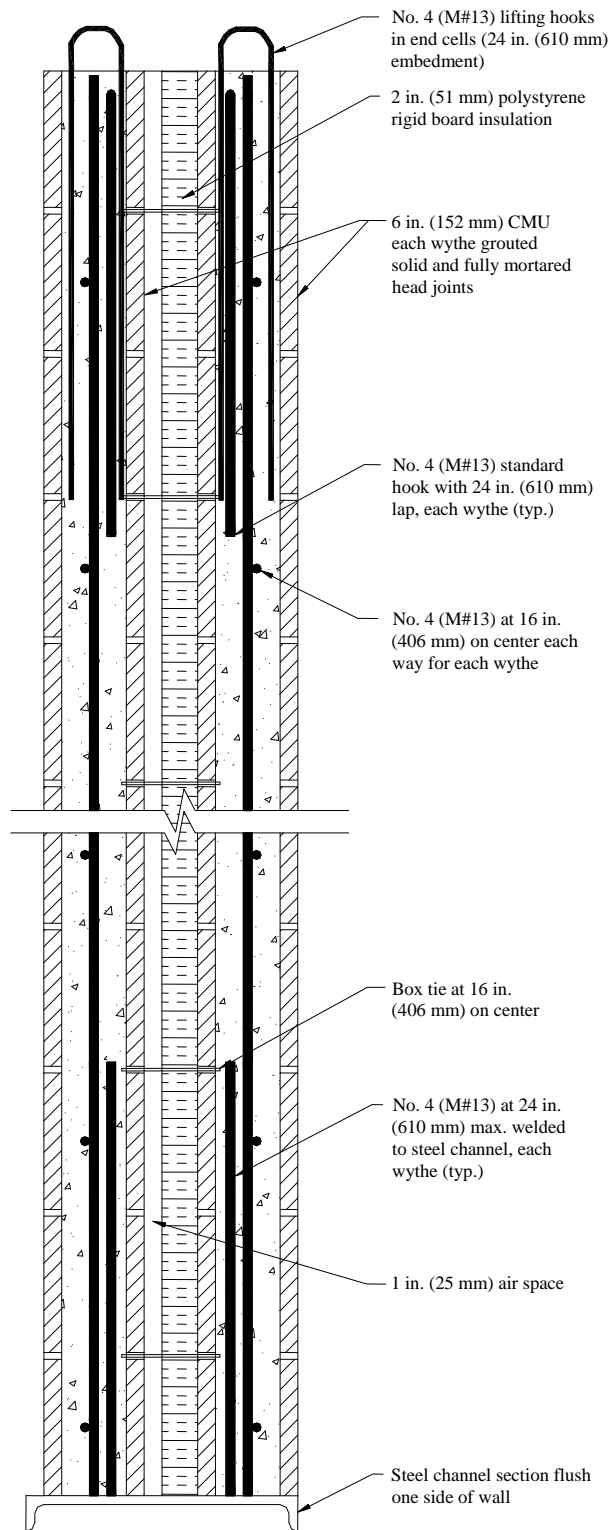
Double-wythe reinforced cavity section (Wall 5)
